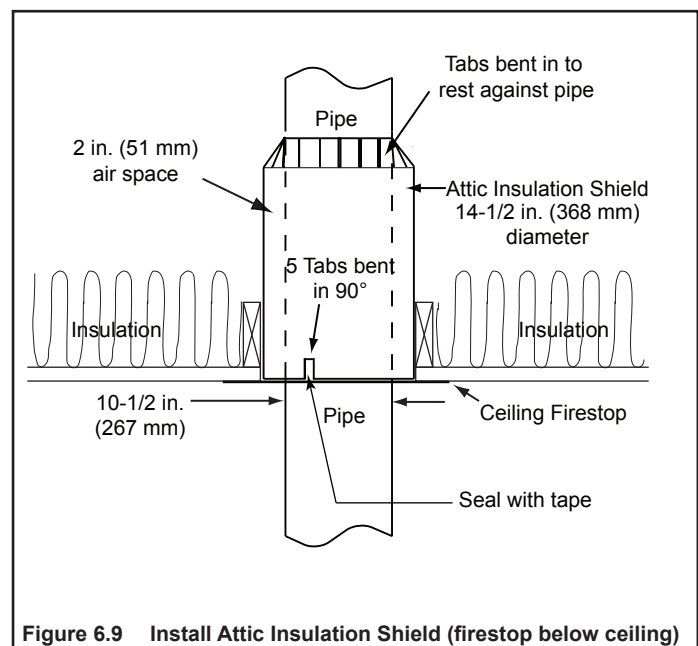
Install Attic Insulation Shield (firestop below ceiling)
